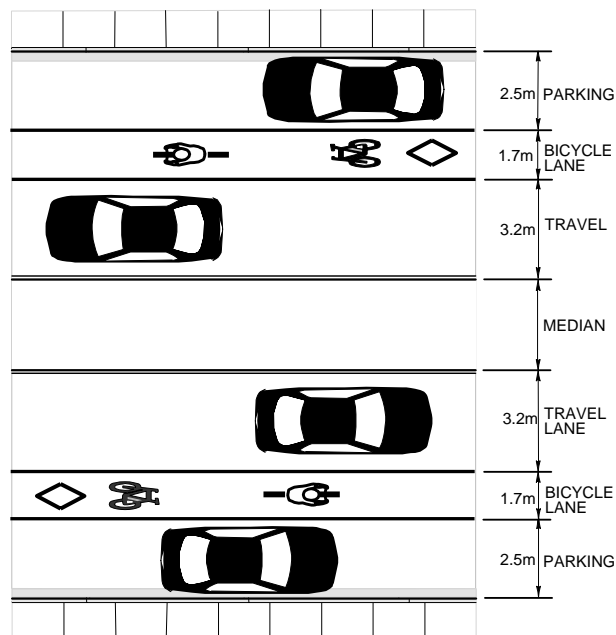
Rupert Street Bike Lanes - Typical Configuration
